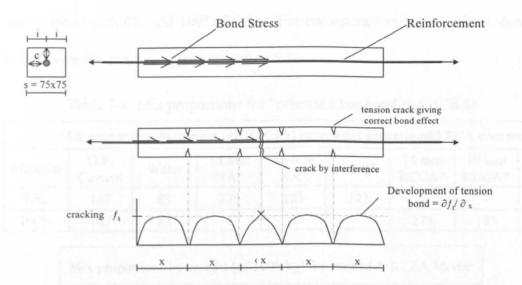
Prismatic section 75 x 75 mm used in a bond test with a diagram demonstrating concrete tensile stress at cracking point.
